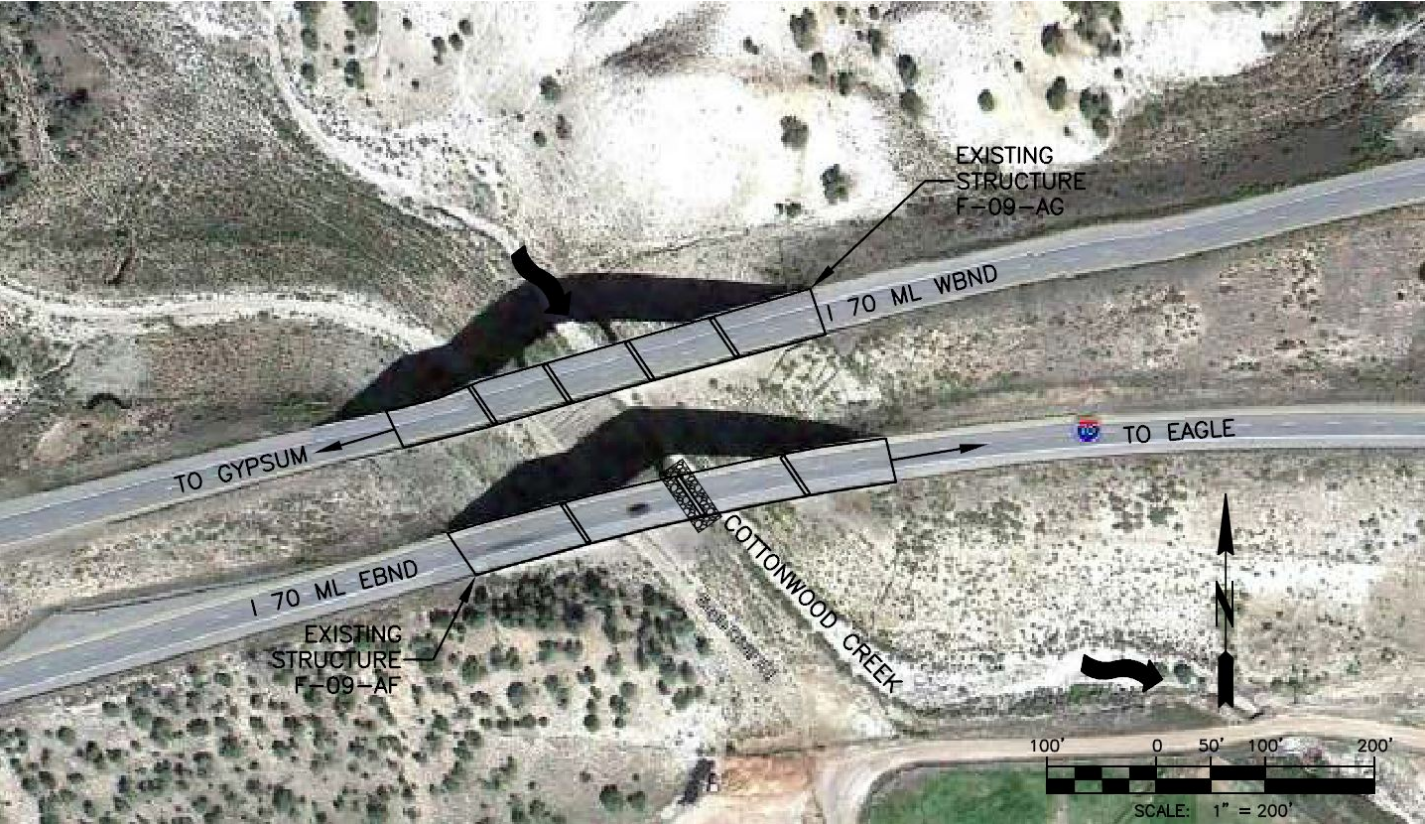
Plan view of Bridge F-09-AF with recommended hydraulic scour countermeasure locations
